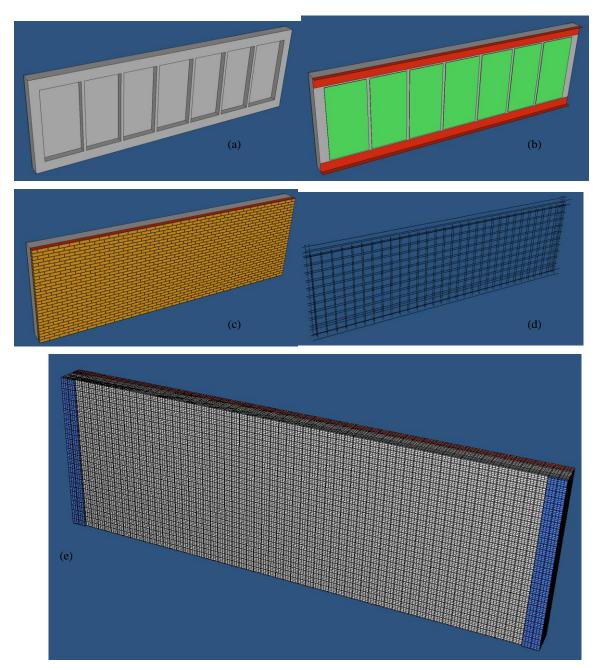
NLFLEX finite element model of cladding panel, (a) concrete, (b) concrete, steelwork and insulation foam, (c) brickwork facing, (d) steel reinforcement, (e) rear face showing boundary elements and spatial discretisation.
